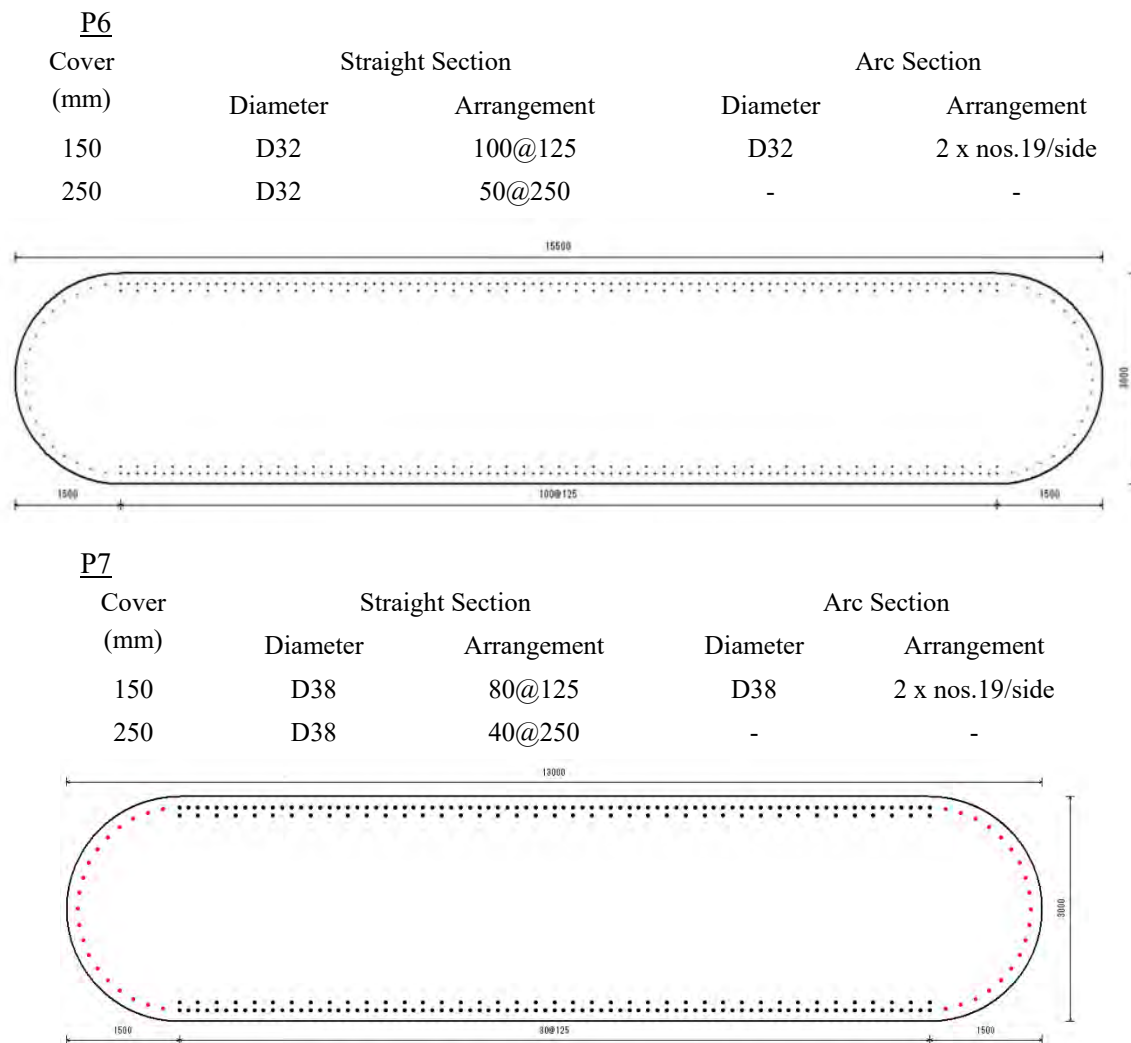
Rebar Arrangement (Main Reinforcement)
